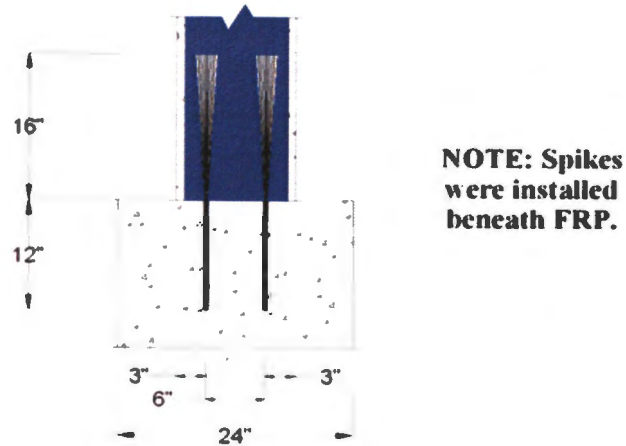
180° Steel Anchor Spikes and GFRP Reinforcement From Prota et al. (2005)
